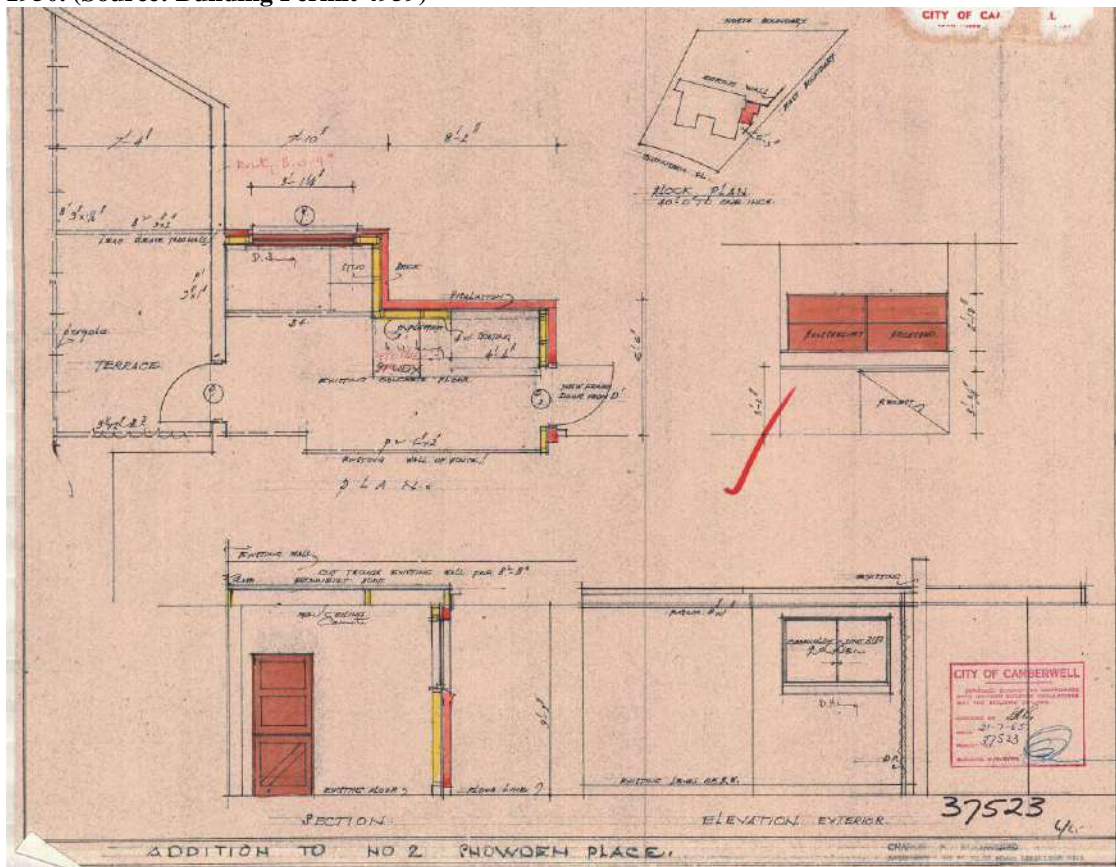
Architectural drawings for additions at 2 Snowden Place by Charles N. Hollinshed, 1965. (Source: Building Permit 37523)
